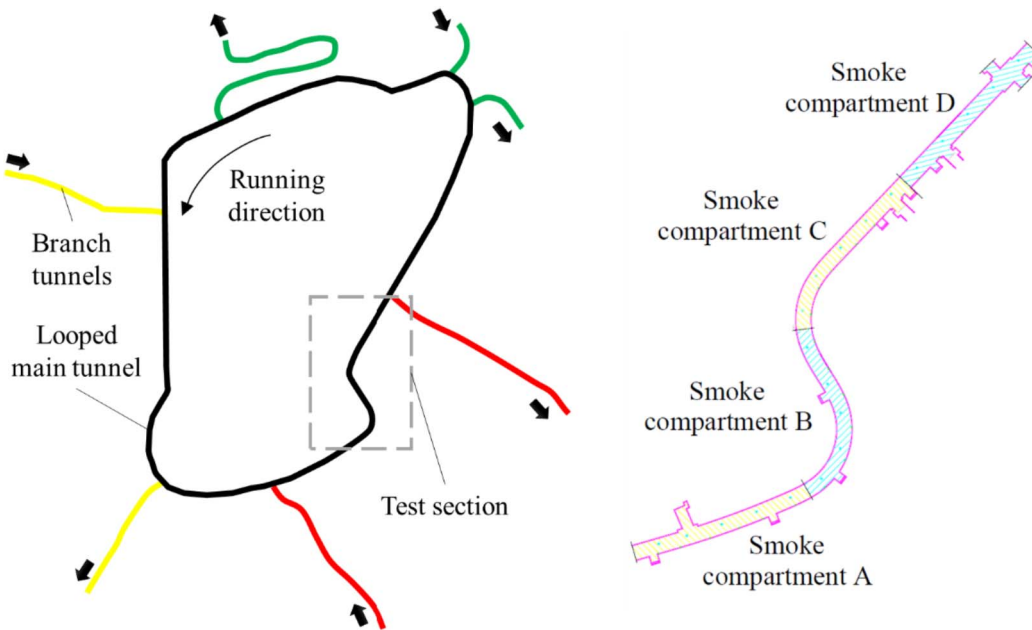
The plan view of the UTLT of PLM (left), zoom-in sketch of the test section (right).
